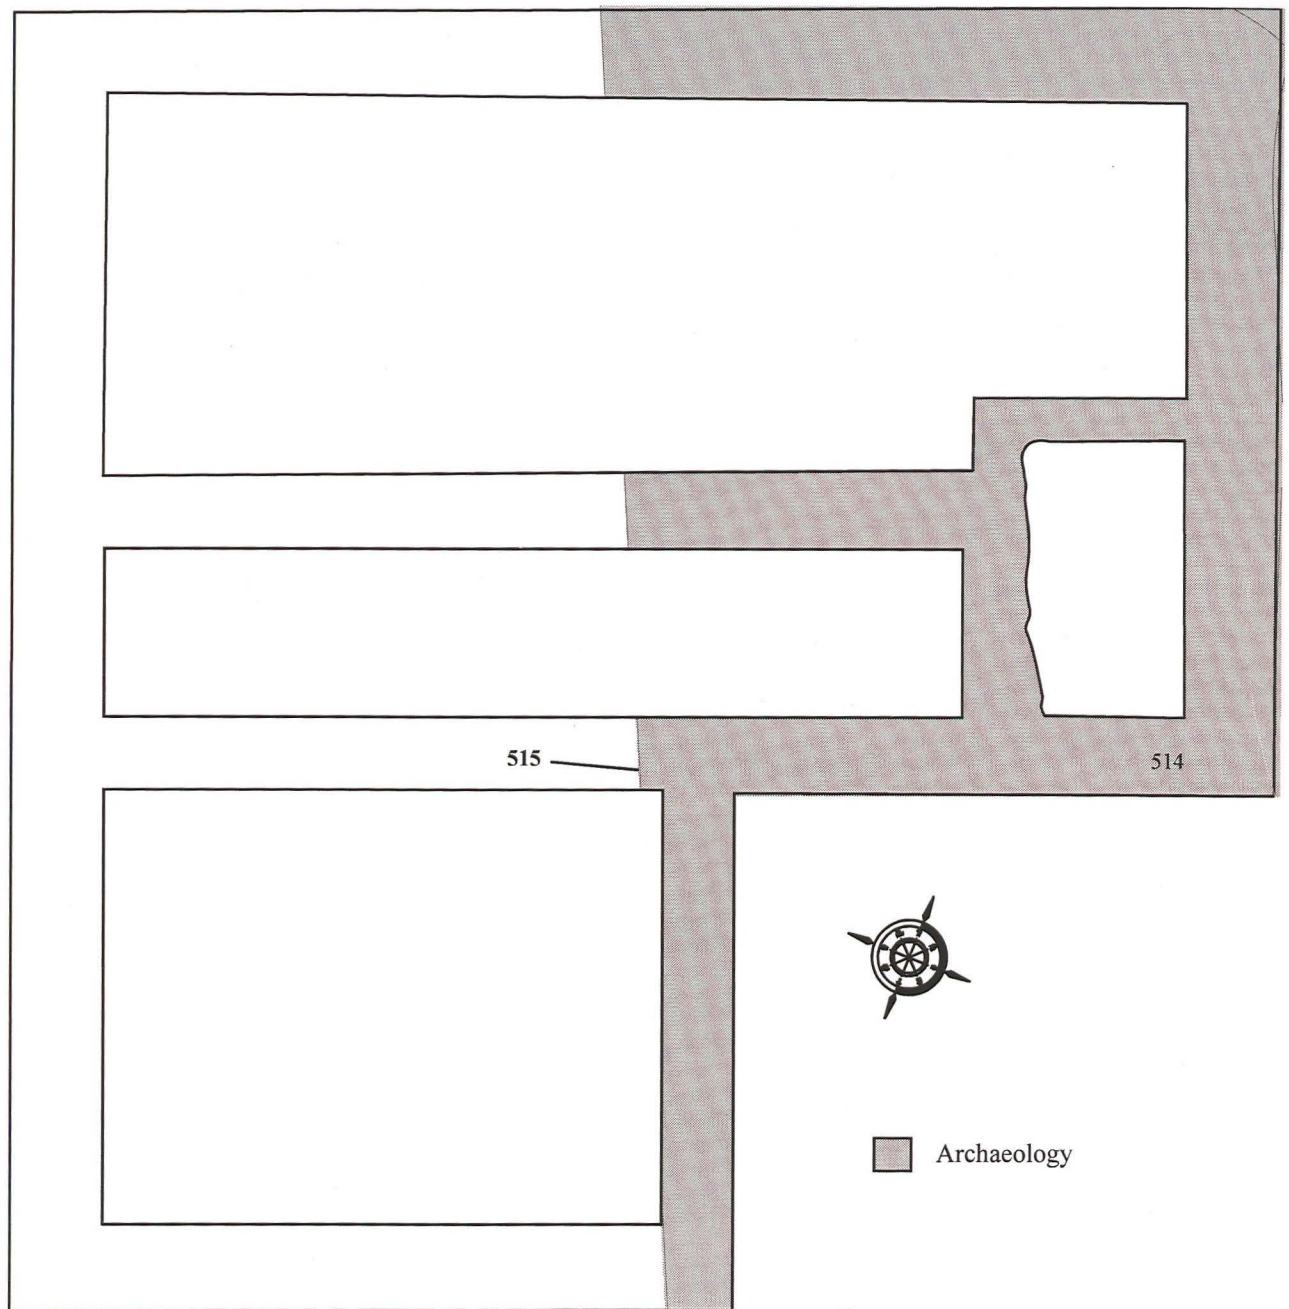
Plan of the foundation trenches, Plot 9, showing the position of ditch 515.
